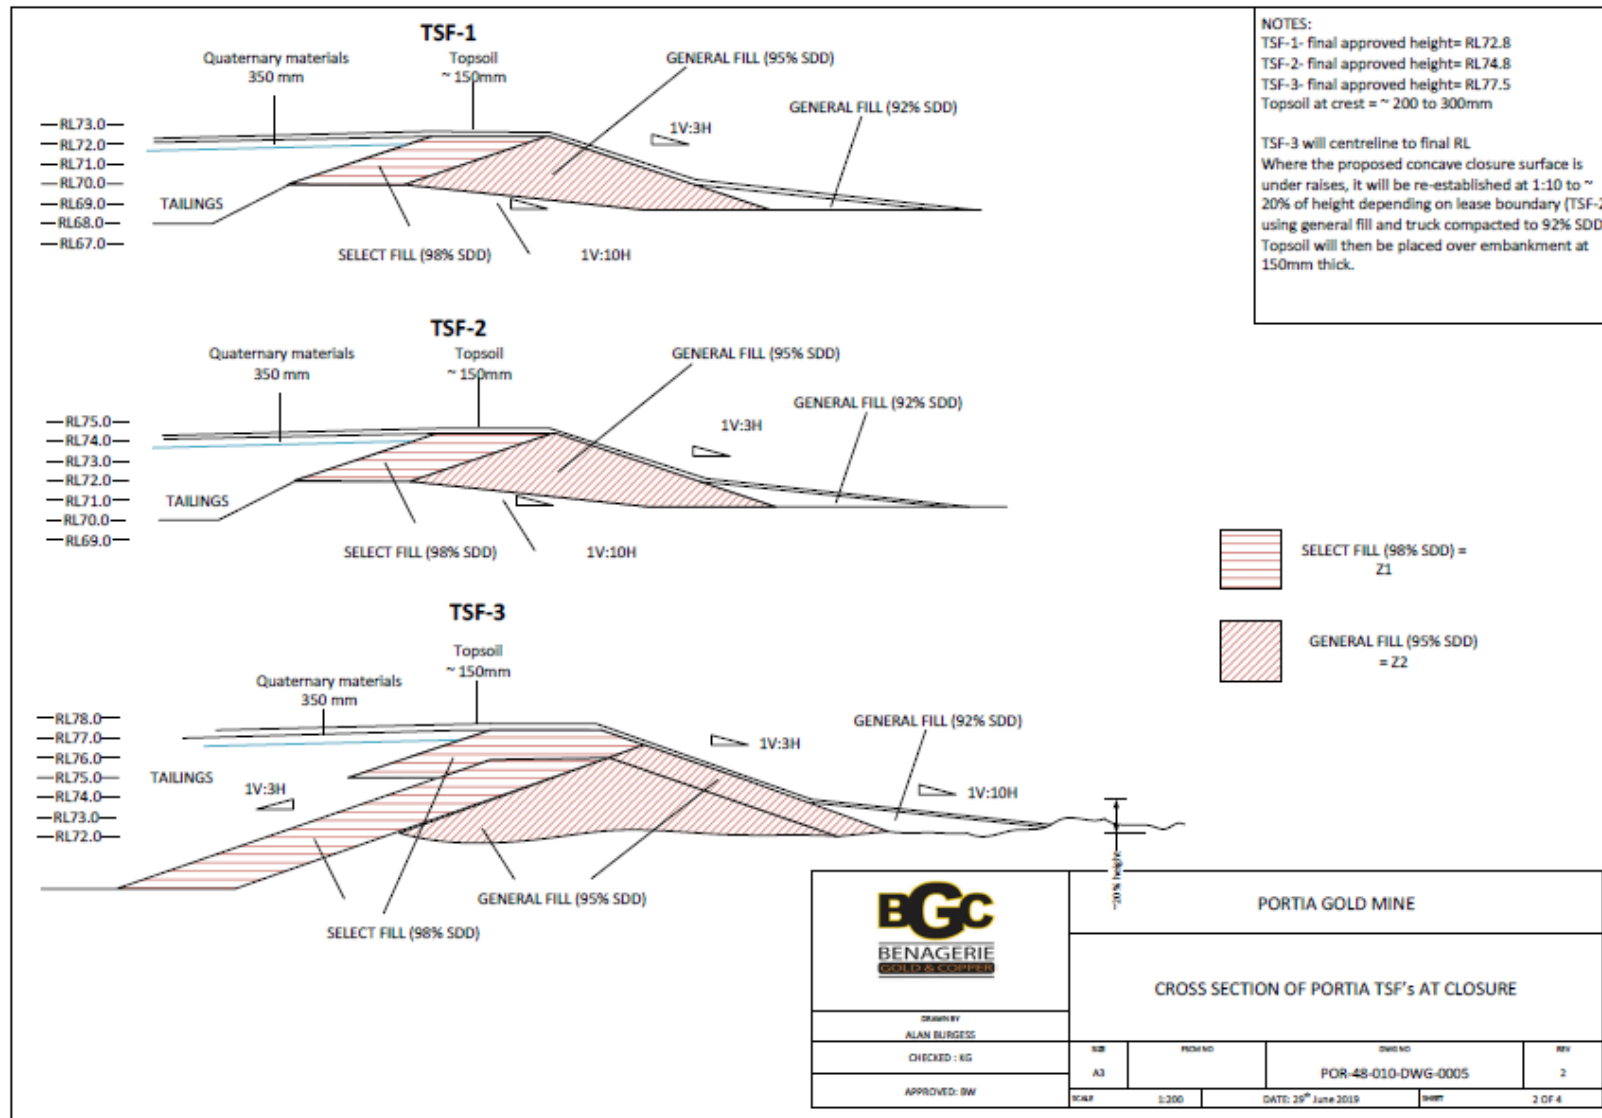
TSF Final Design Cross-Sections (TSF-1, 2 and 3)
